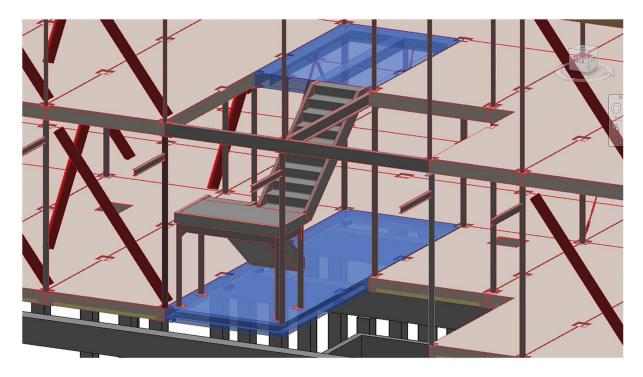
3D modelling of building showing connecting floors and bracings 153
